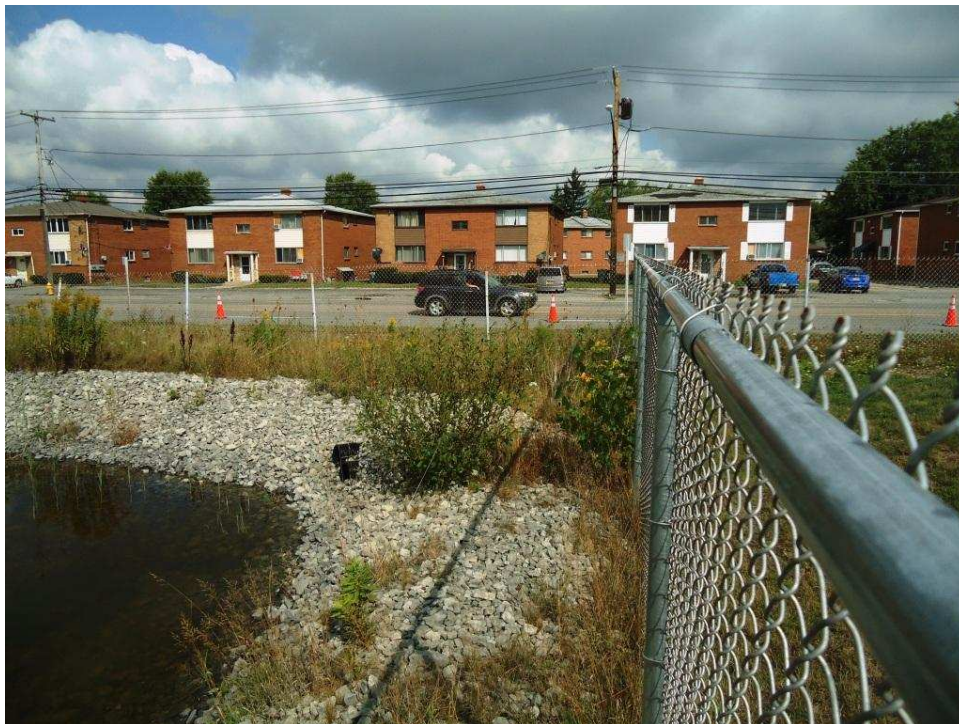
Retention pond looking north. Outlet pipes in northeast corner of pond.
